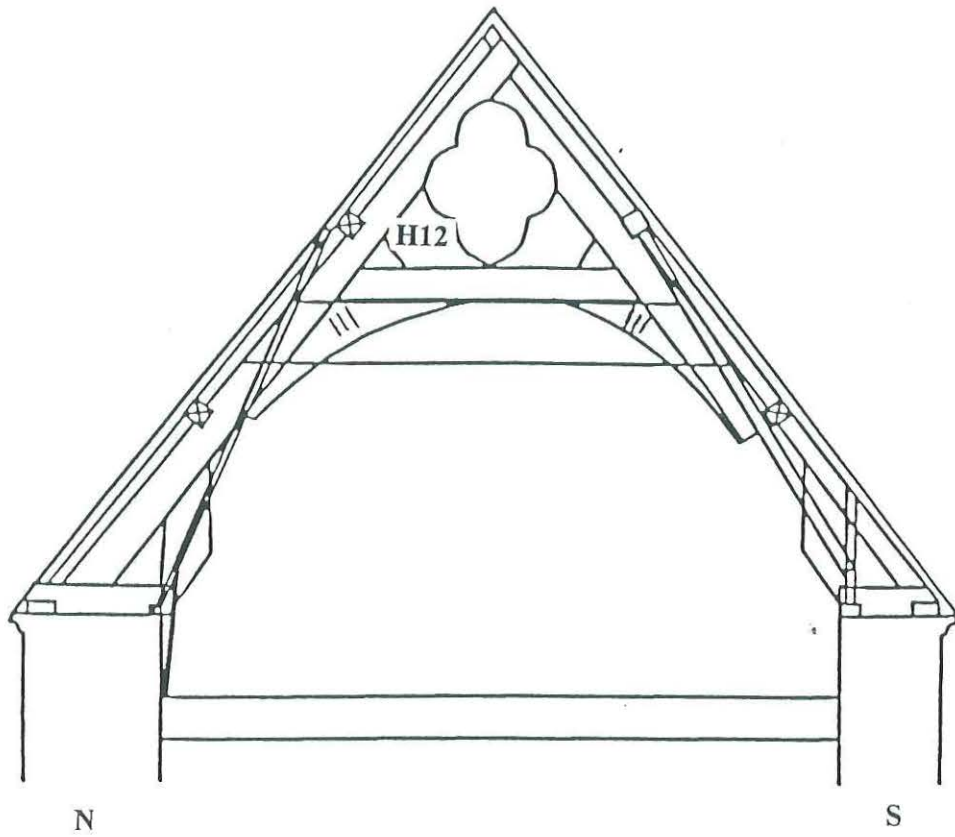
Sketch long-section of gatehouse roof to show positions of samples
